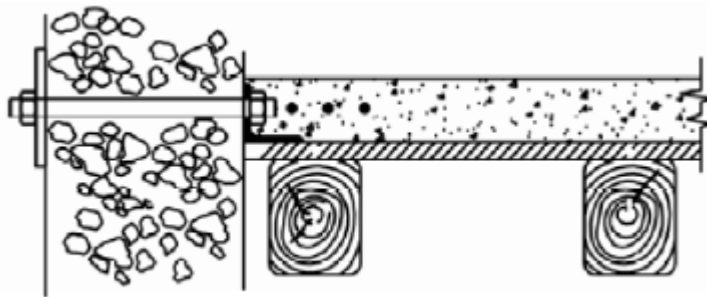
Steel bolts used for connection improvement (a) (from E. Vintzilaiou – “Lecture notes on Advanced Mechanics of Masonry”)
